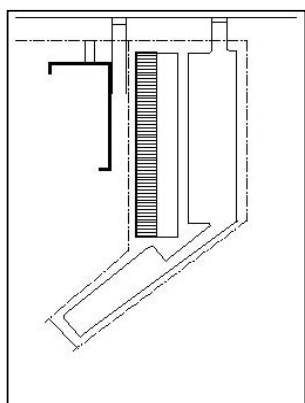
Unacceptable: Site plan of typical deep-lot residential development with no orientation to the street.
